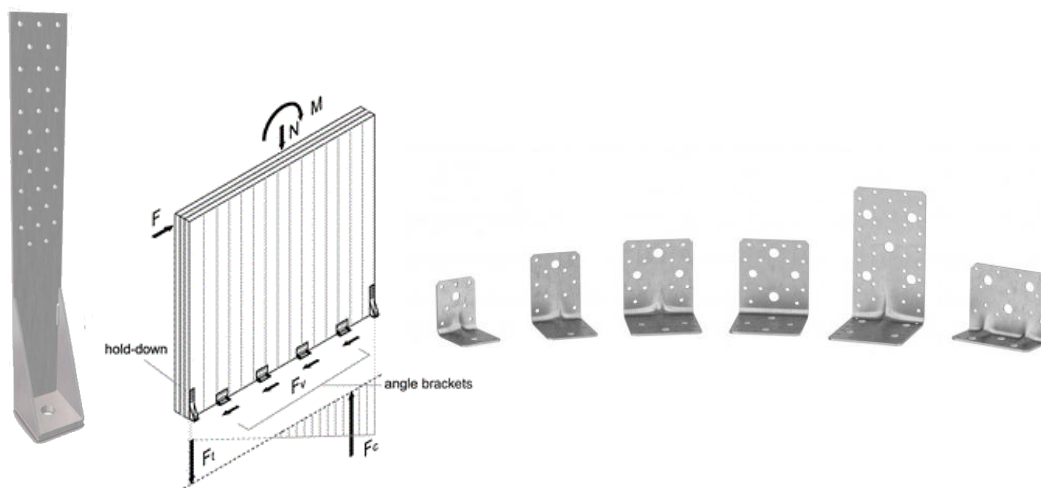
Schematic representation of a CLT wall and typical joints (i.e. hold-down and angle bracket)
